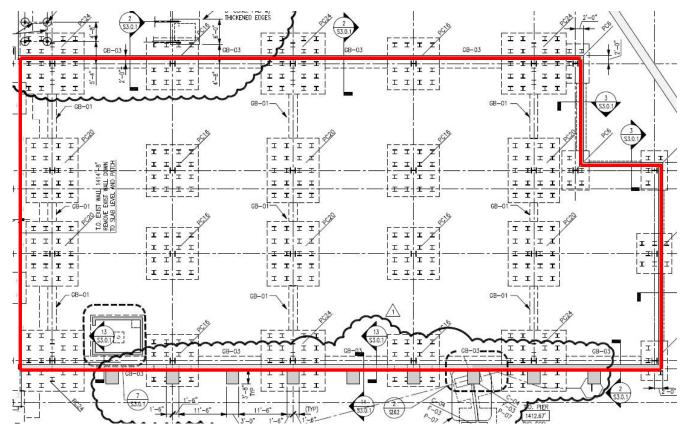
Steel Pile/Pile Caps Plan Drawings Courtesy of JCJ Architecture
